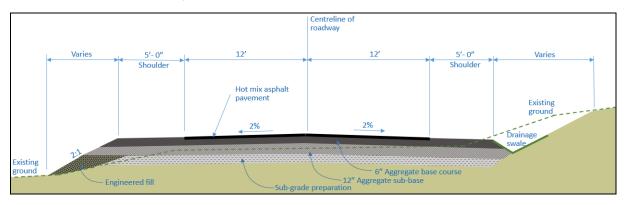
Typical road cross-section. Based on the design standard developed for Kosrae circumferential road extension project (Barret Consulting Group Inc., 1987).
